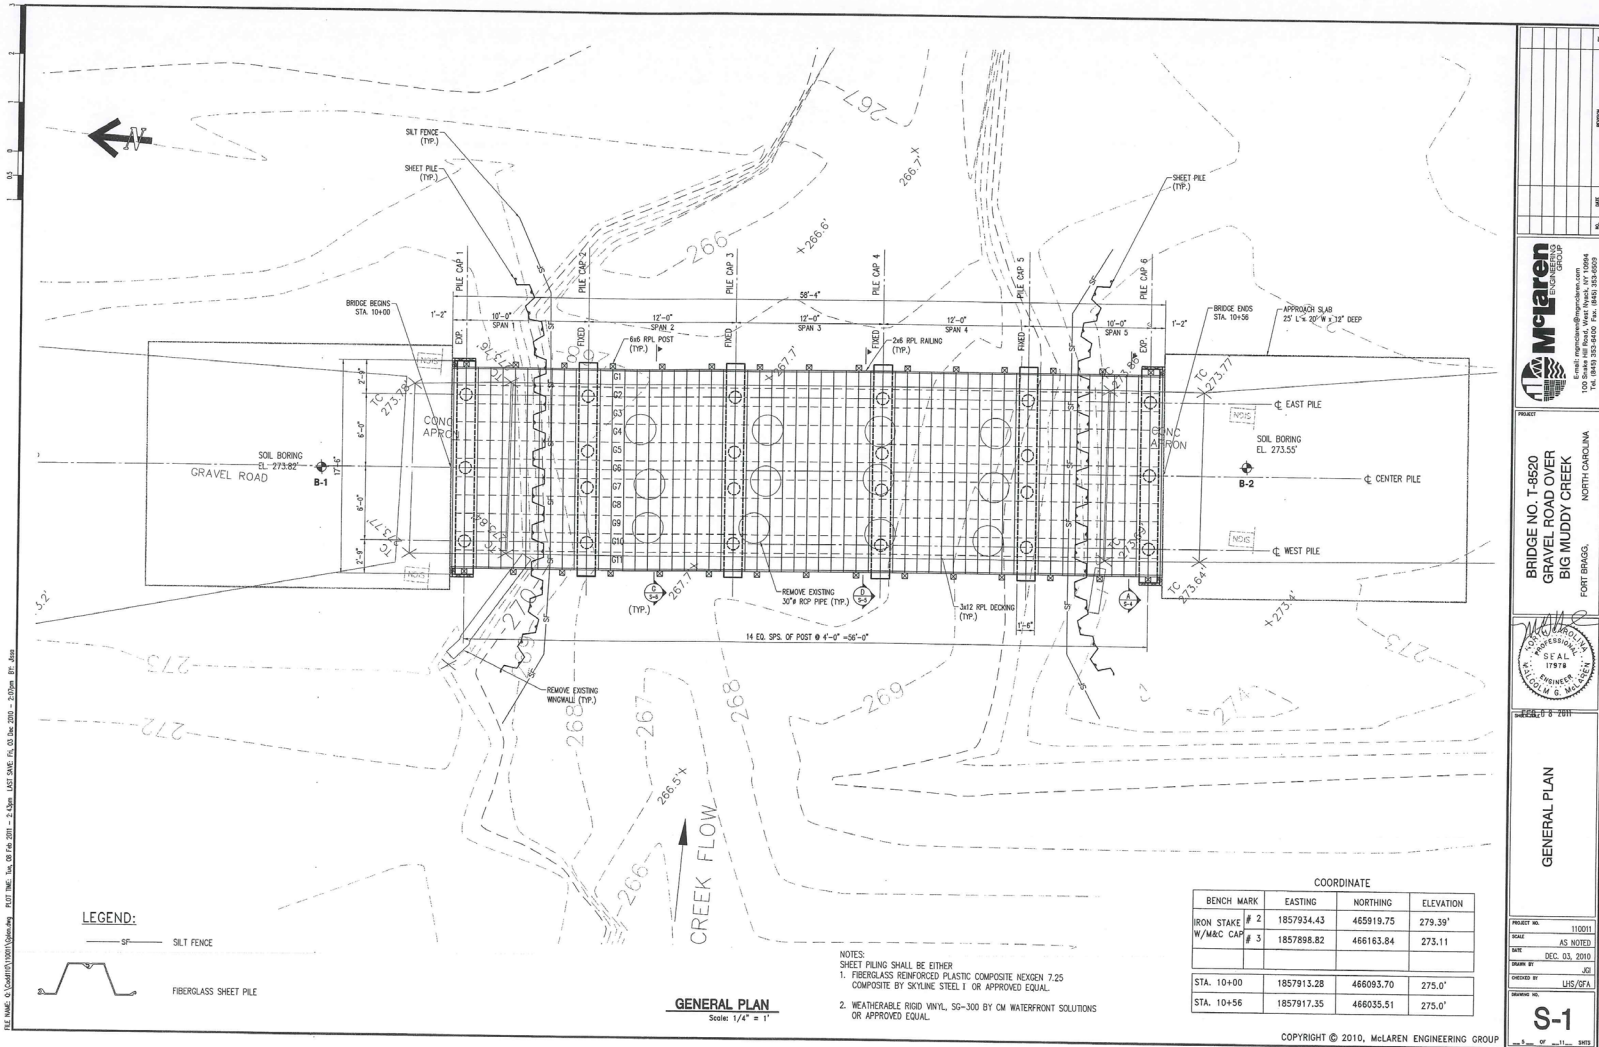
Sheet S-1, general plan for Bridge T-8520, showing alternative vinyl sheet piling.
